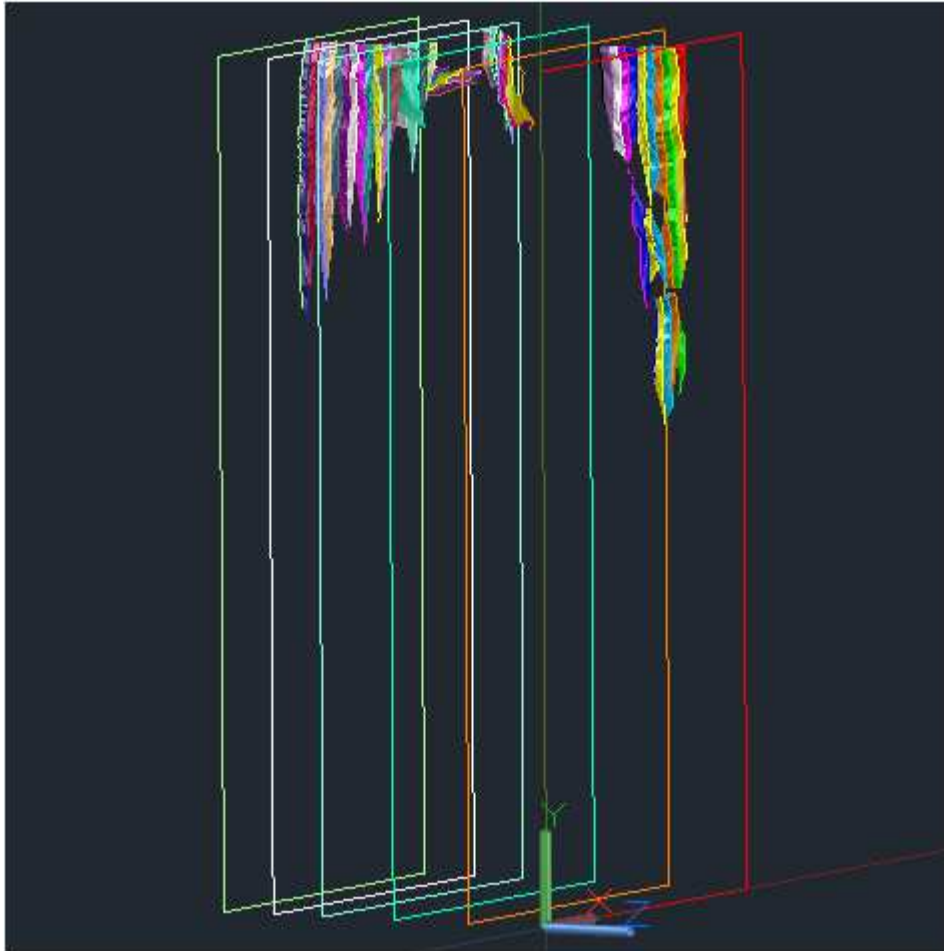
Side view with complete vertical and horizontal crack (side to side).
